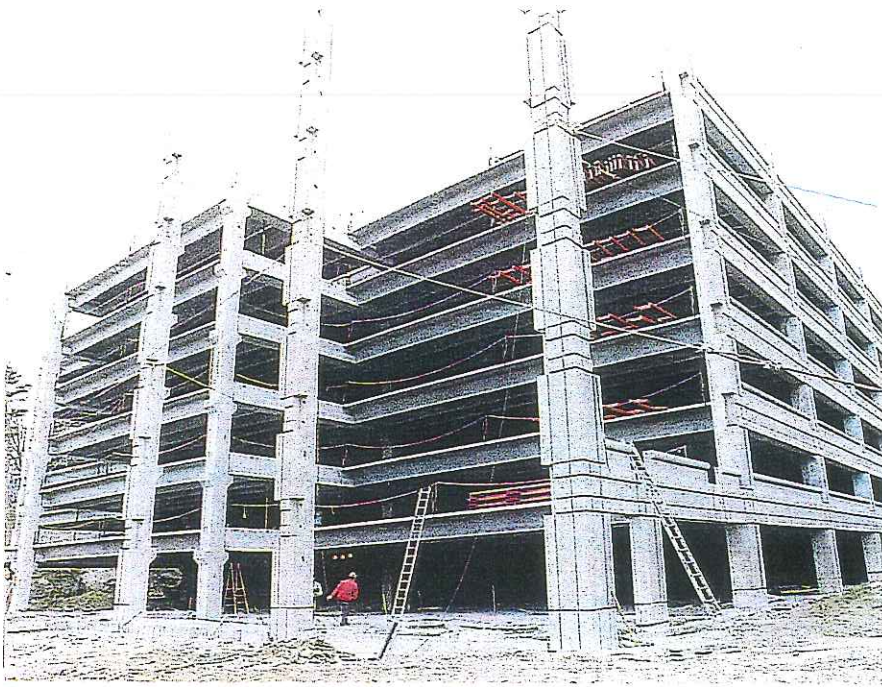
Erection of precast/prestressed concrete frame of parking structure.
